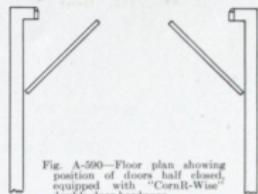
Floor plan showing position of doors half closed, equipped with "CornR-Wise" double door hardware.
